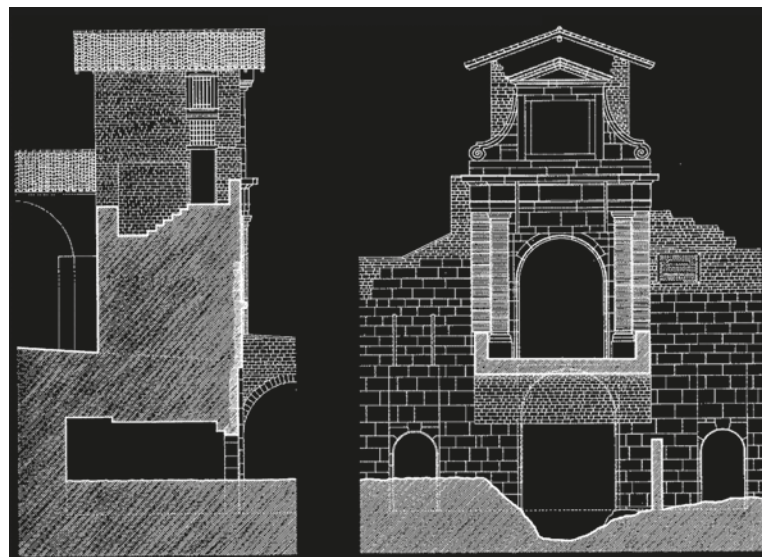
Elevation and cross-section of Porta di San Lorenzo (College of Surveyors of Bergamo around 1980).
